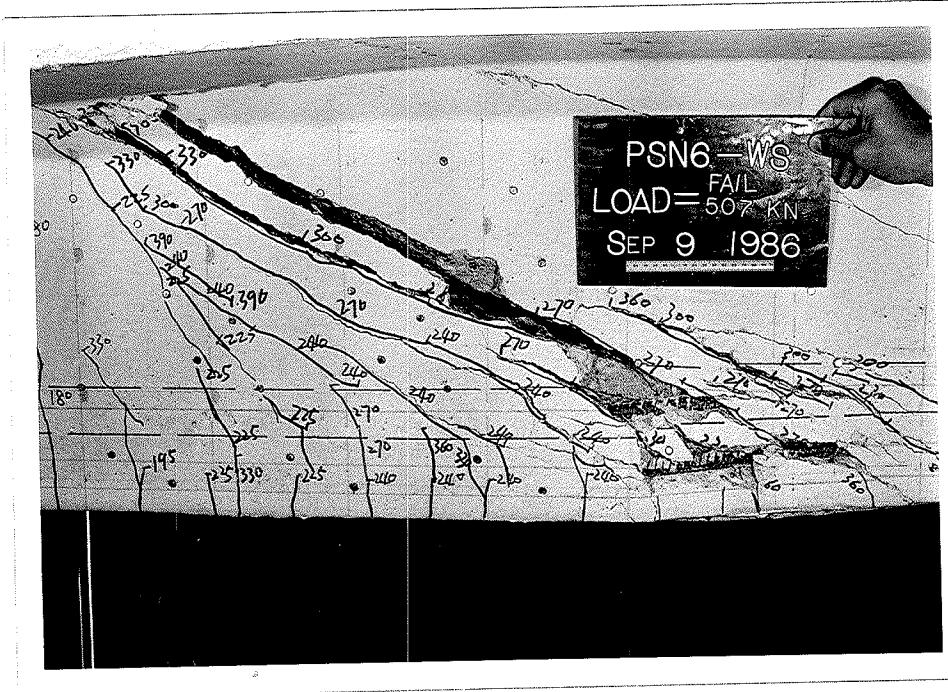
PSN6 Failure Crack of Beam PSN6-WS
